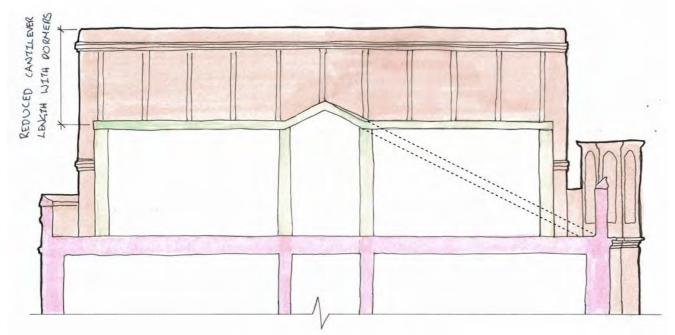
Elevation of north chimney stack showing reduced cantilever length with dormers. Dashed line shows actual front roof line proposed to remain
